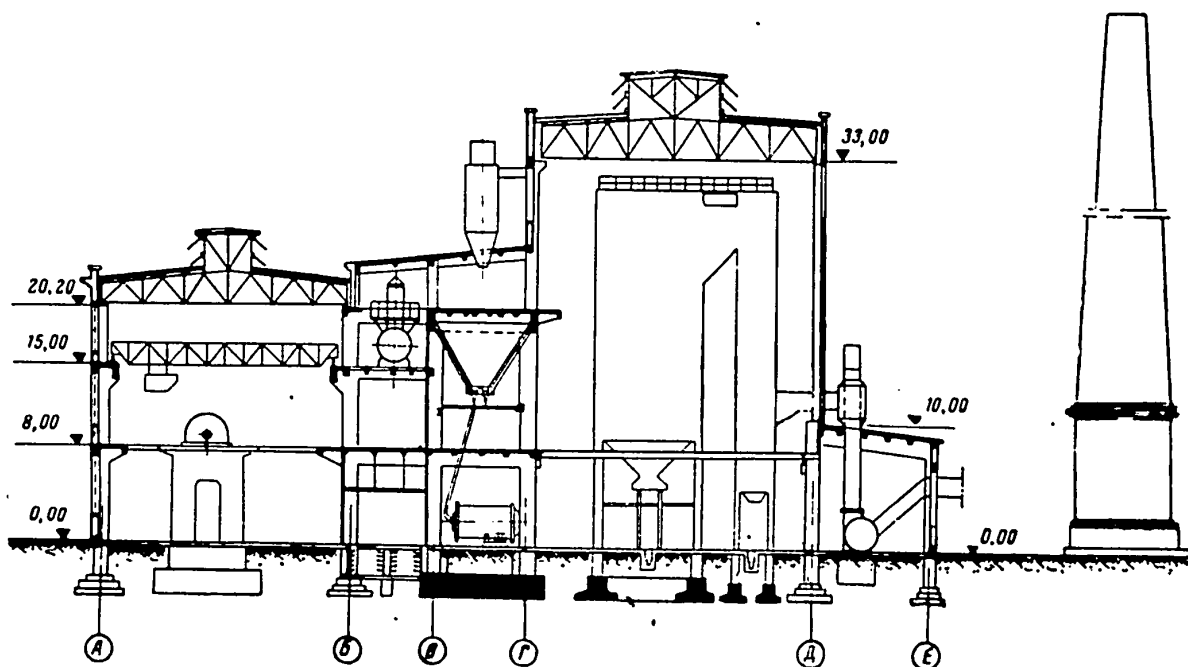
Frame construction entirely in precast reinforced concrete.
